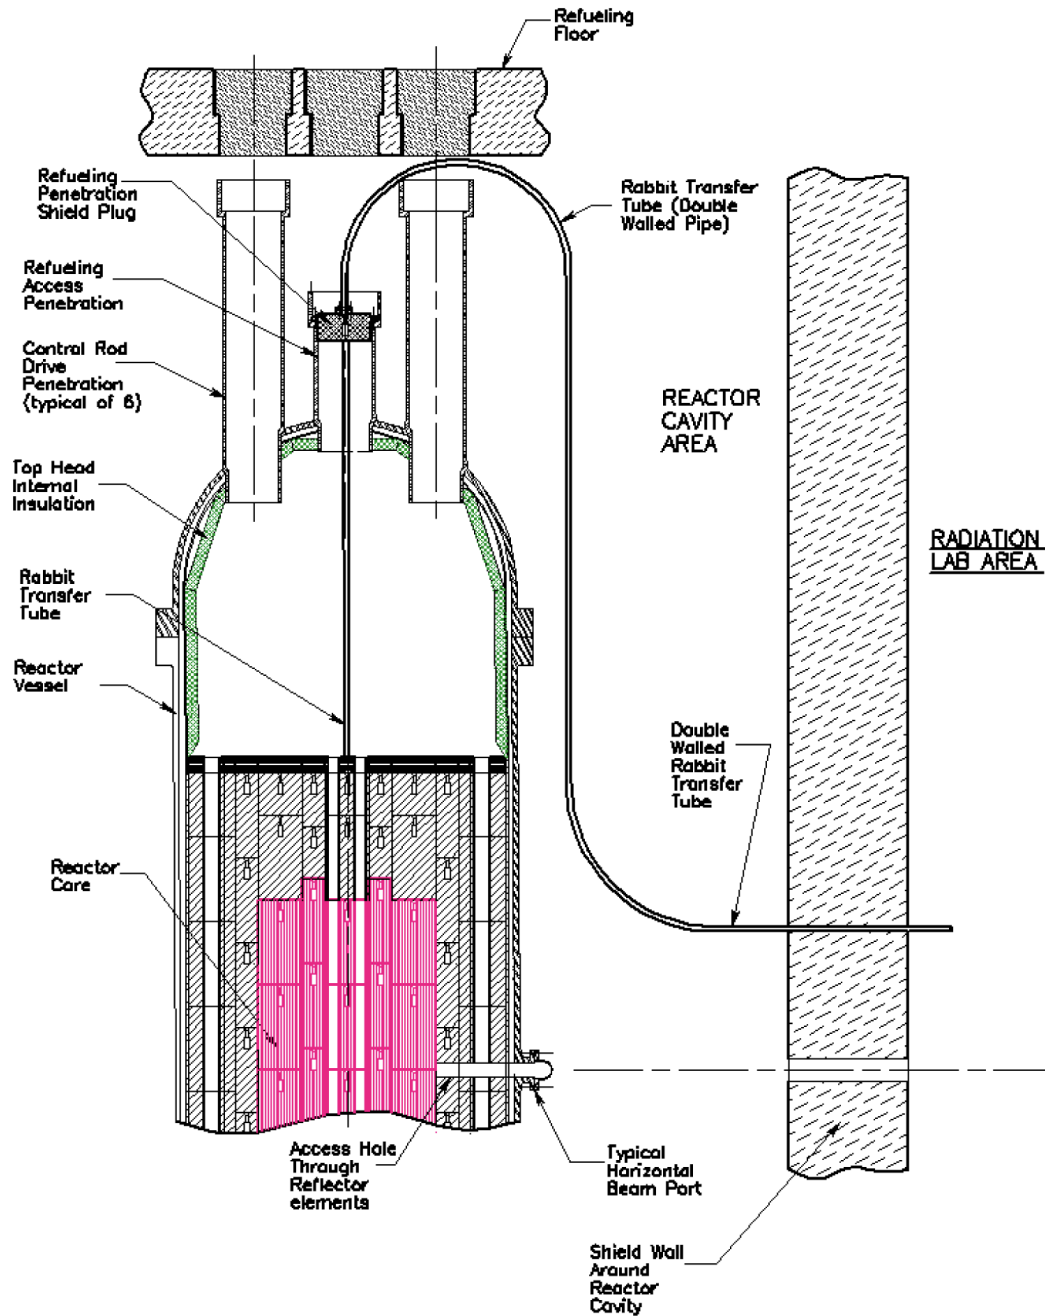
Elevation view showing rabbit tube and neutron beam port layout.
